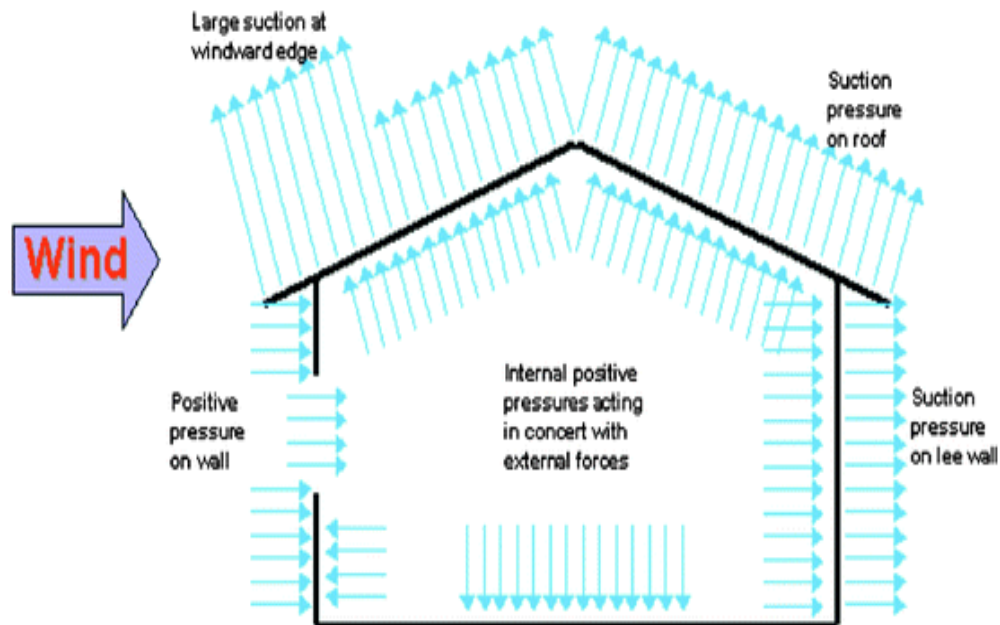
Wind load acting on low rise building, source (Kopp, 2013).
